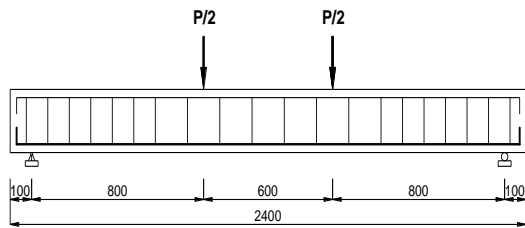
Detailing of 9 beam specimens (dimensions in mm)
